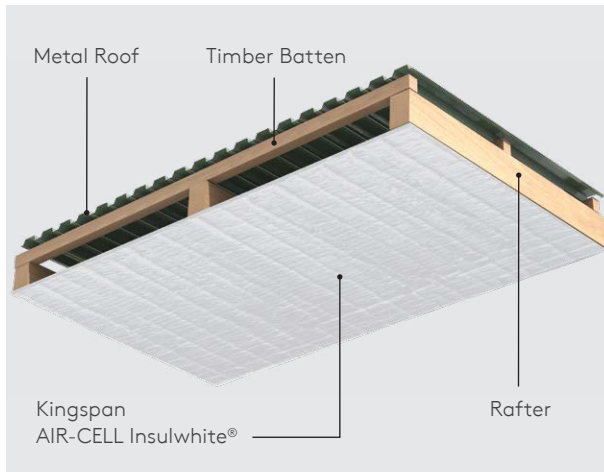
Kingspan AIR-CELL Insulwhite® in a pitched metal roof retrofit installation (attic conversion).
